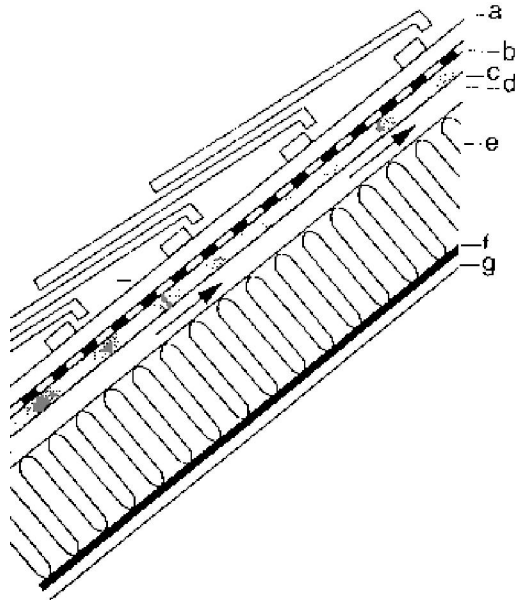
Example of room in the roof with sloping ceiling and insulation between rafters must have adequate ventilation above the insulation
